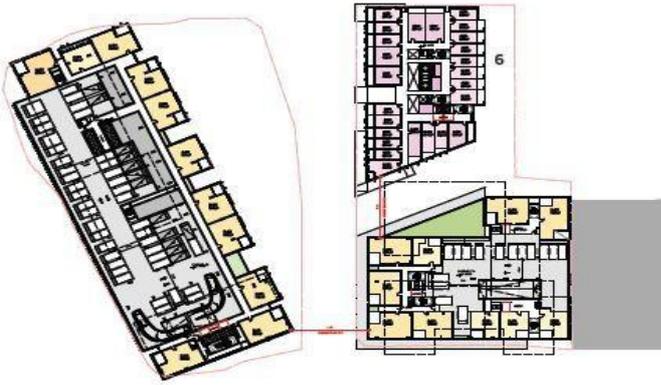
(above): Excerpts from the winning ground floor scheme and typical podium level design indicating sleeving from SJB Post Competition Design Review document.
